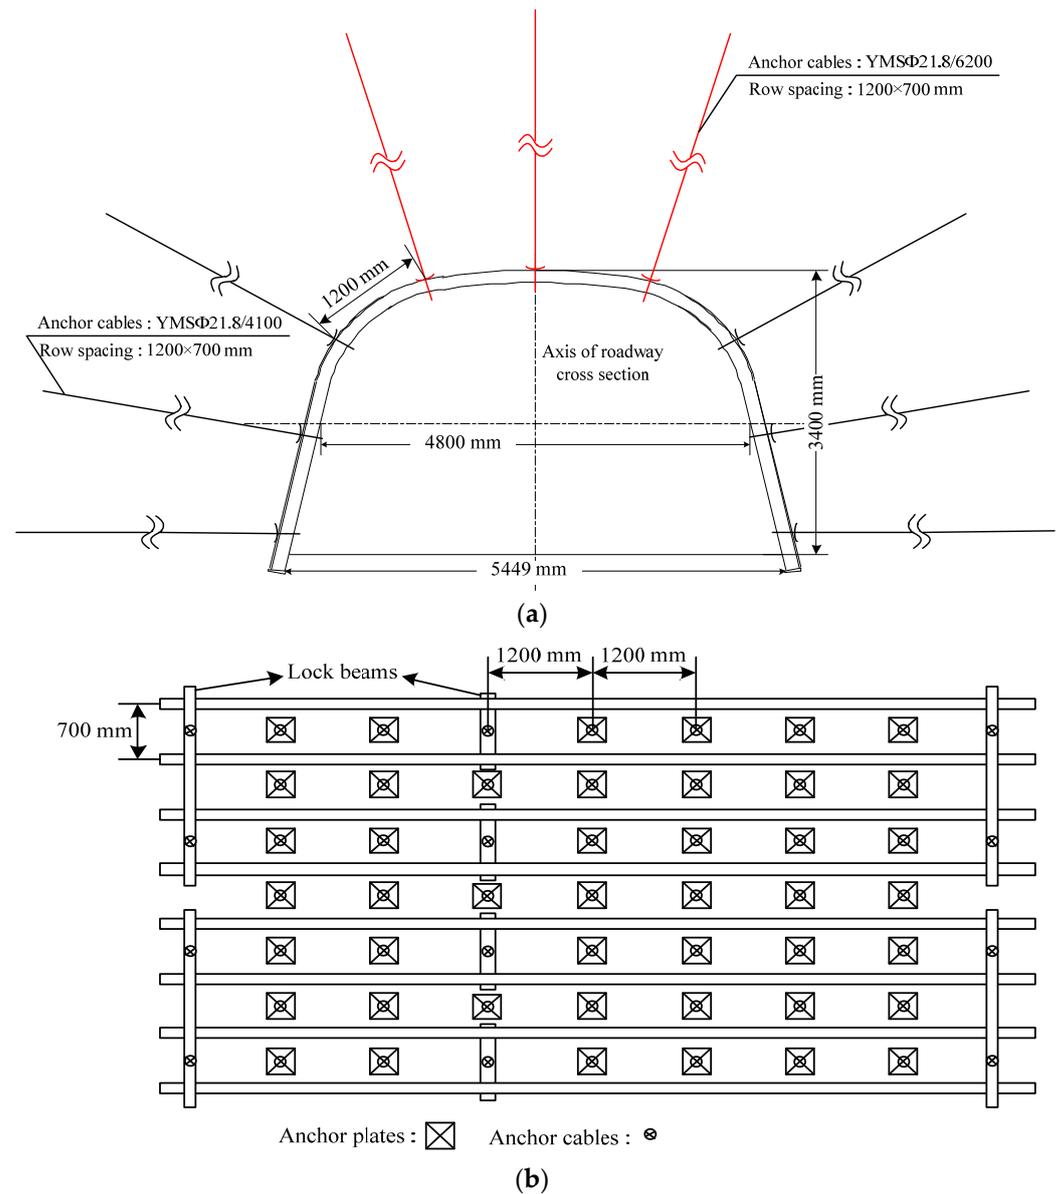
Schematic diagram of flat-roof U-shaped steel sheds and anchor cables for the roadway support. (a) Roadway section. (b) Roadway plan.
